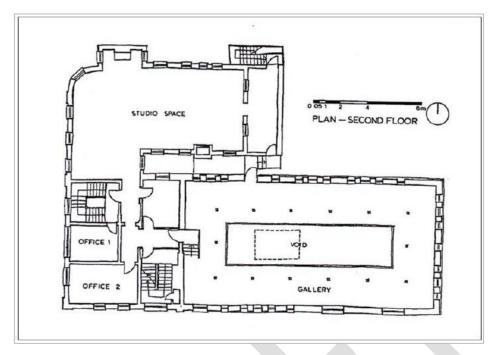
Second Floor plan, showing the configuration of the building in 1990. (Source: Bligh Robertson Architects, Sydney Sailor's Home (former) (106-8 George Street) Conservation Plan, (Feb 1990))
